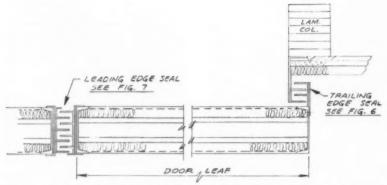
Single inside door leaf construction, showing leading- and trailing-edge seals.
